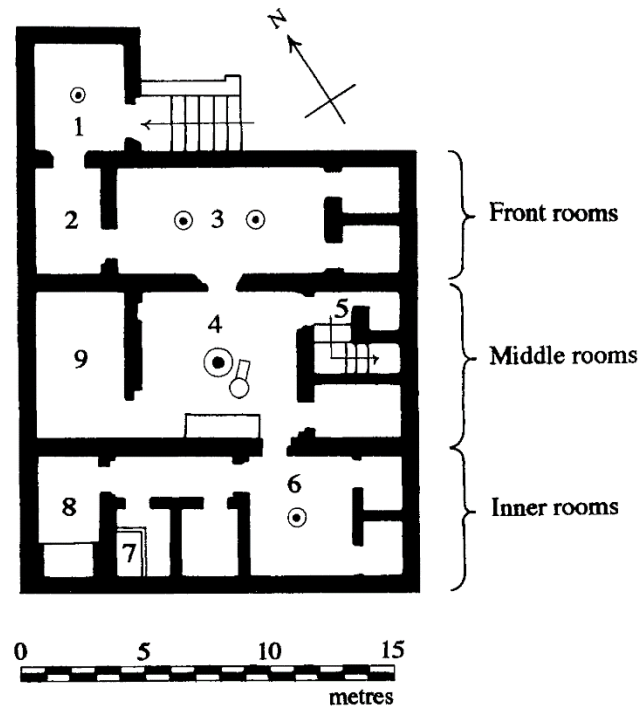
Amarna, plan of house M47.4 (Borchardt and Ricke 1980b, plate 17; Spence 2004: 126, figure 1).
